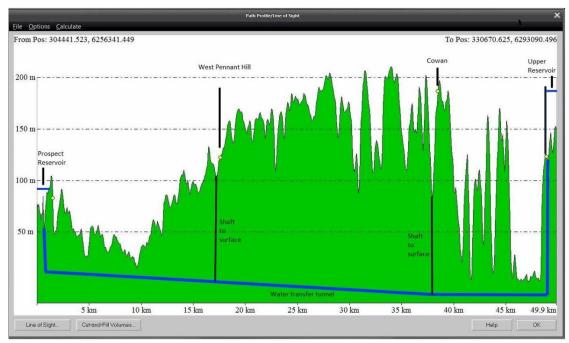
Water Transfer Tunnel Route - Longitudinal Section
